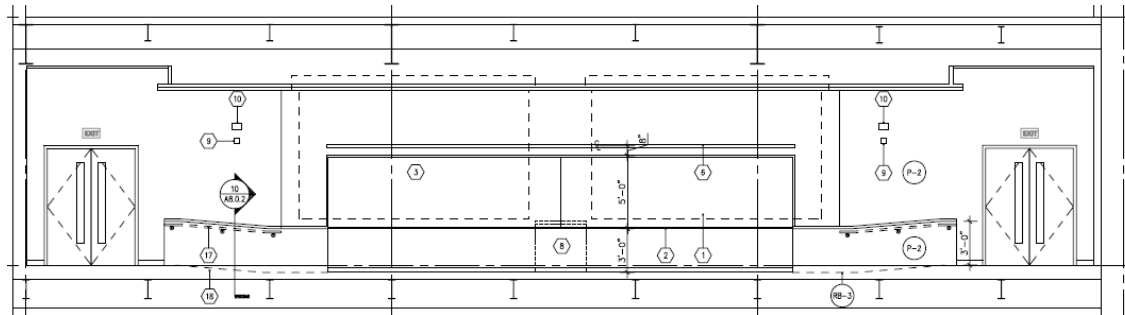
135-Seat Classroom Front Elevation/Section
